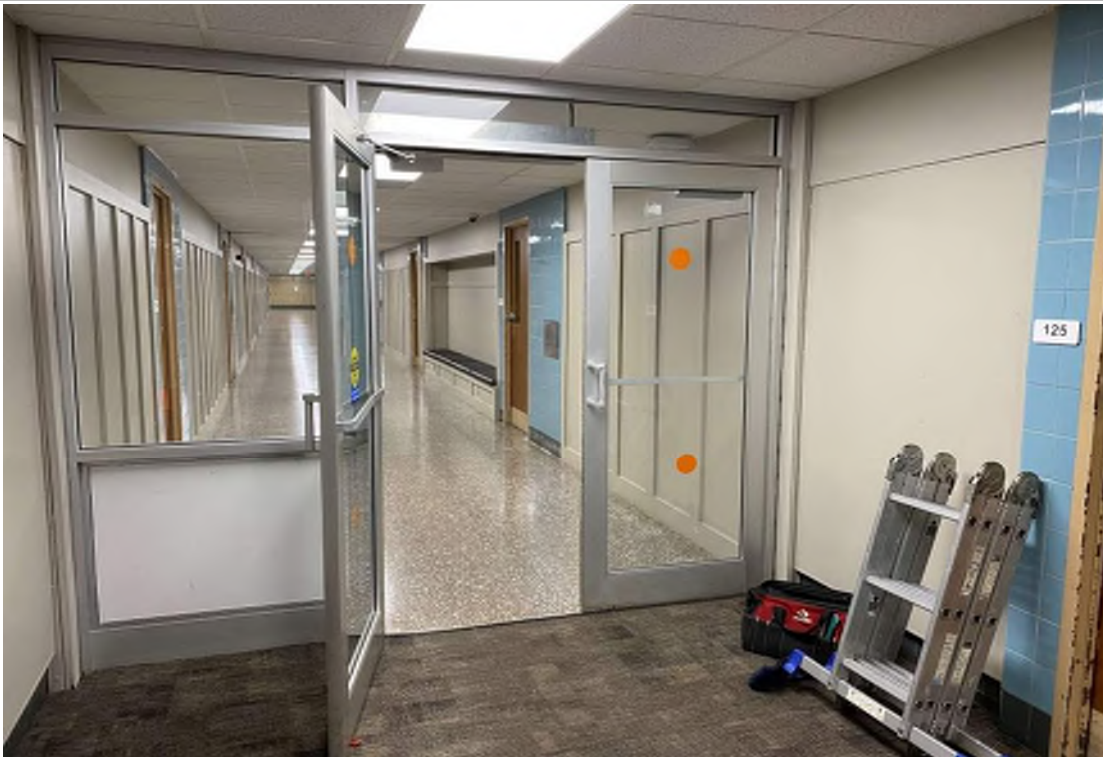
View of a storefront style door and window system in the first floor corridor by Room 125. The door frame caulk and window glazing compound for this type of storefront style door and windows in the corridors was determined to be non-ACM. Window glazing compound in these types of windows was determined to be non-ACM.
